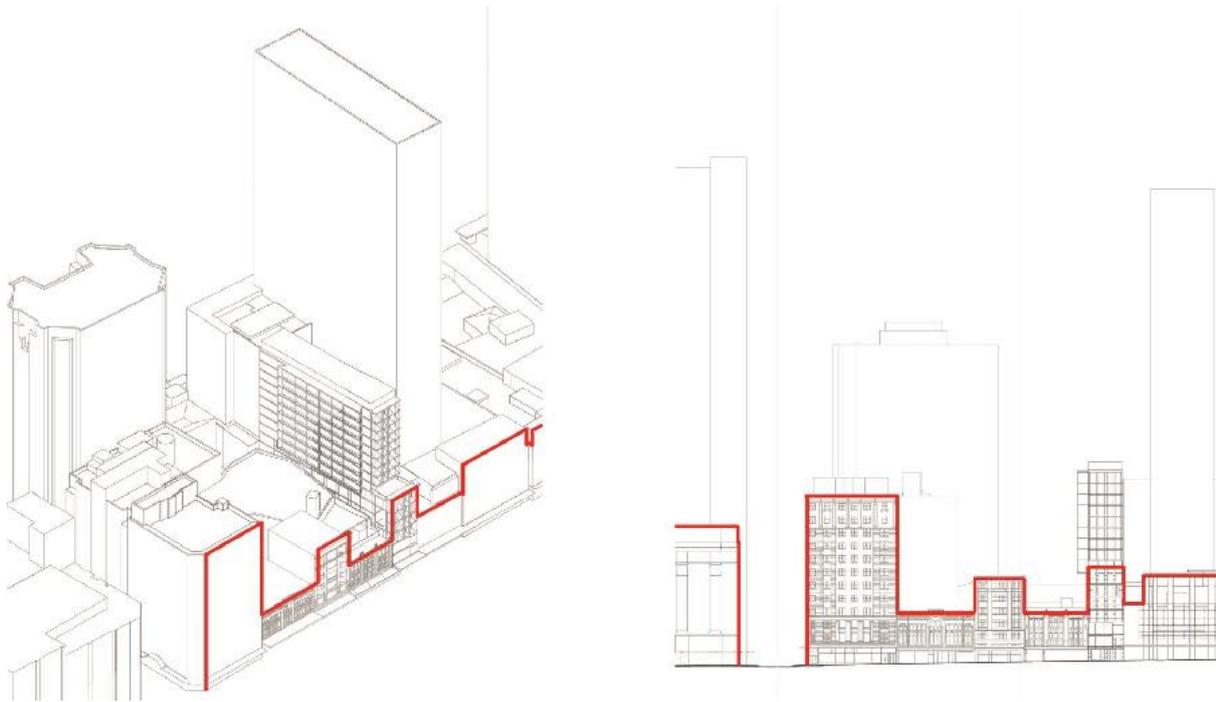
Extract from 'Facade Design Development Report (Candalepas Associates), showing axonometric and elevation drawings of the street wall heights along the eastern side of George St
